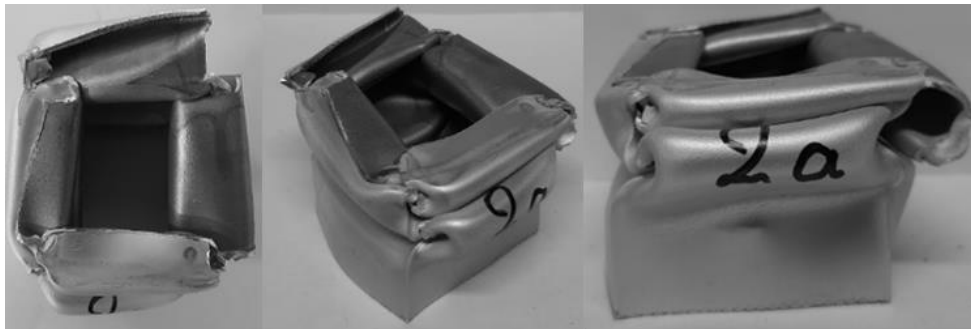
Final views of crushed specimen in test 2a under contact in corner
